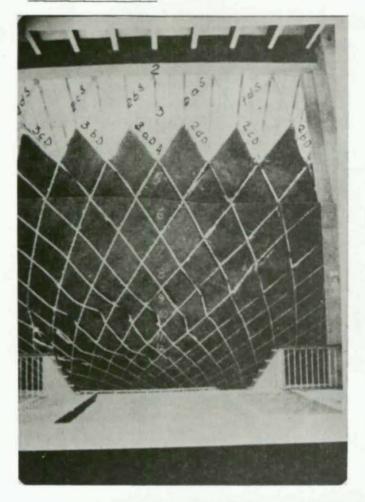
View of Bucharest Dome after failure, from Interior Mezzanine. The dome structure hangs down from its support ring. Note the line of deformed tubes, and that most other tubes are undamaged.
